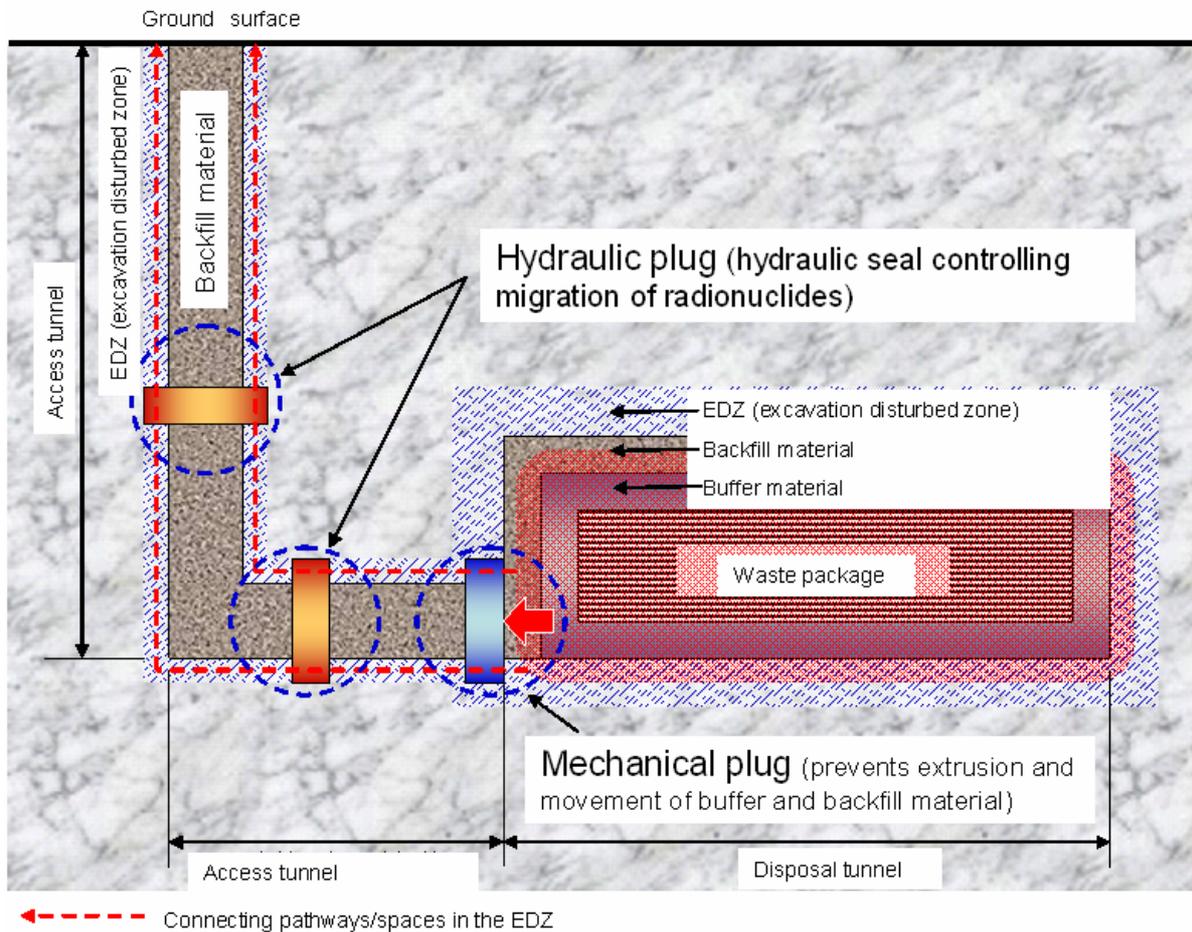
Function of backfill and plugs in a disposal facility for TRU waste
